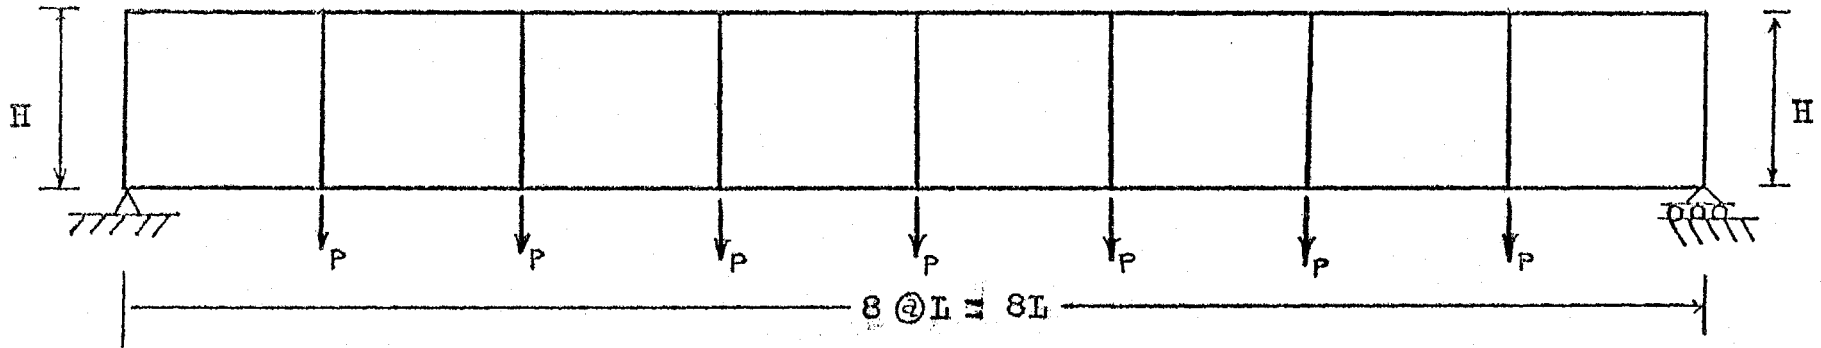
Vierendeel Truss With Panel Point Loads
